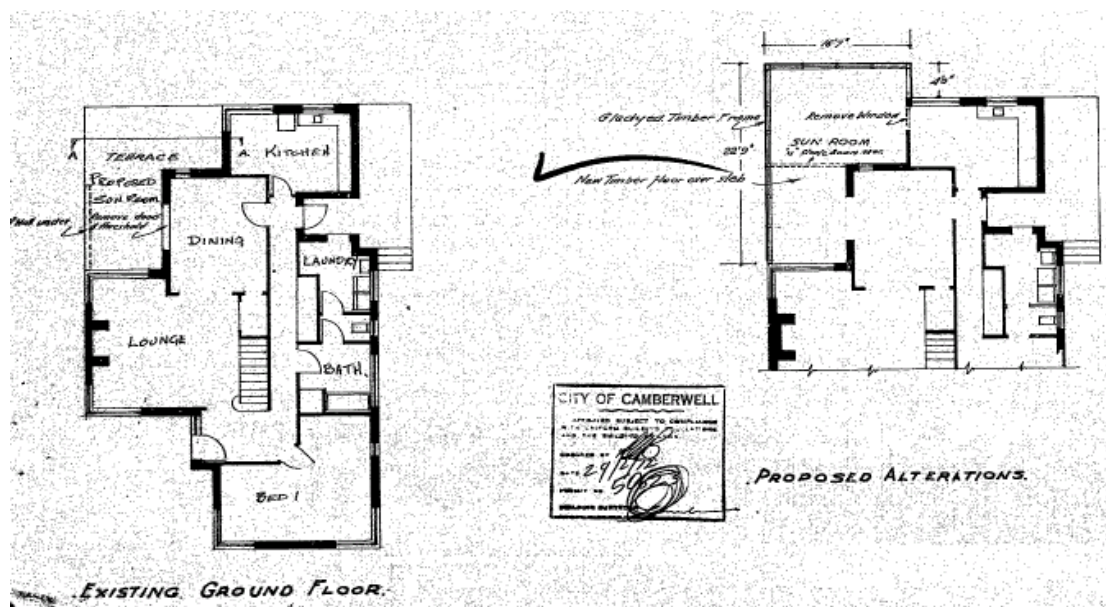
Detail from the 1972 building permit plan showing the proposed sunroom addition at the rear of the house. (Source: BP 50623)
